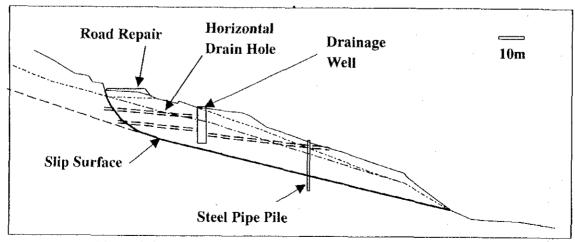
Cross Section (Steel Pipe Pile and Drainage Well)
